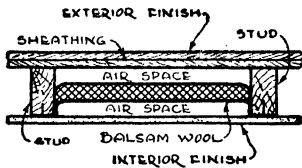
Application of Flexible Insulation with Nailing Flange to Frame Construction; if Insulation has Spacer Flange Two Air Spaces Will Be Provided as Shown when the Interior Finish is Installed.
